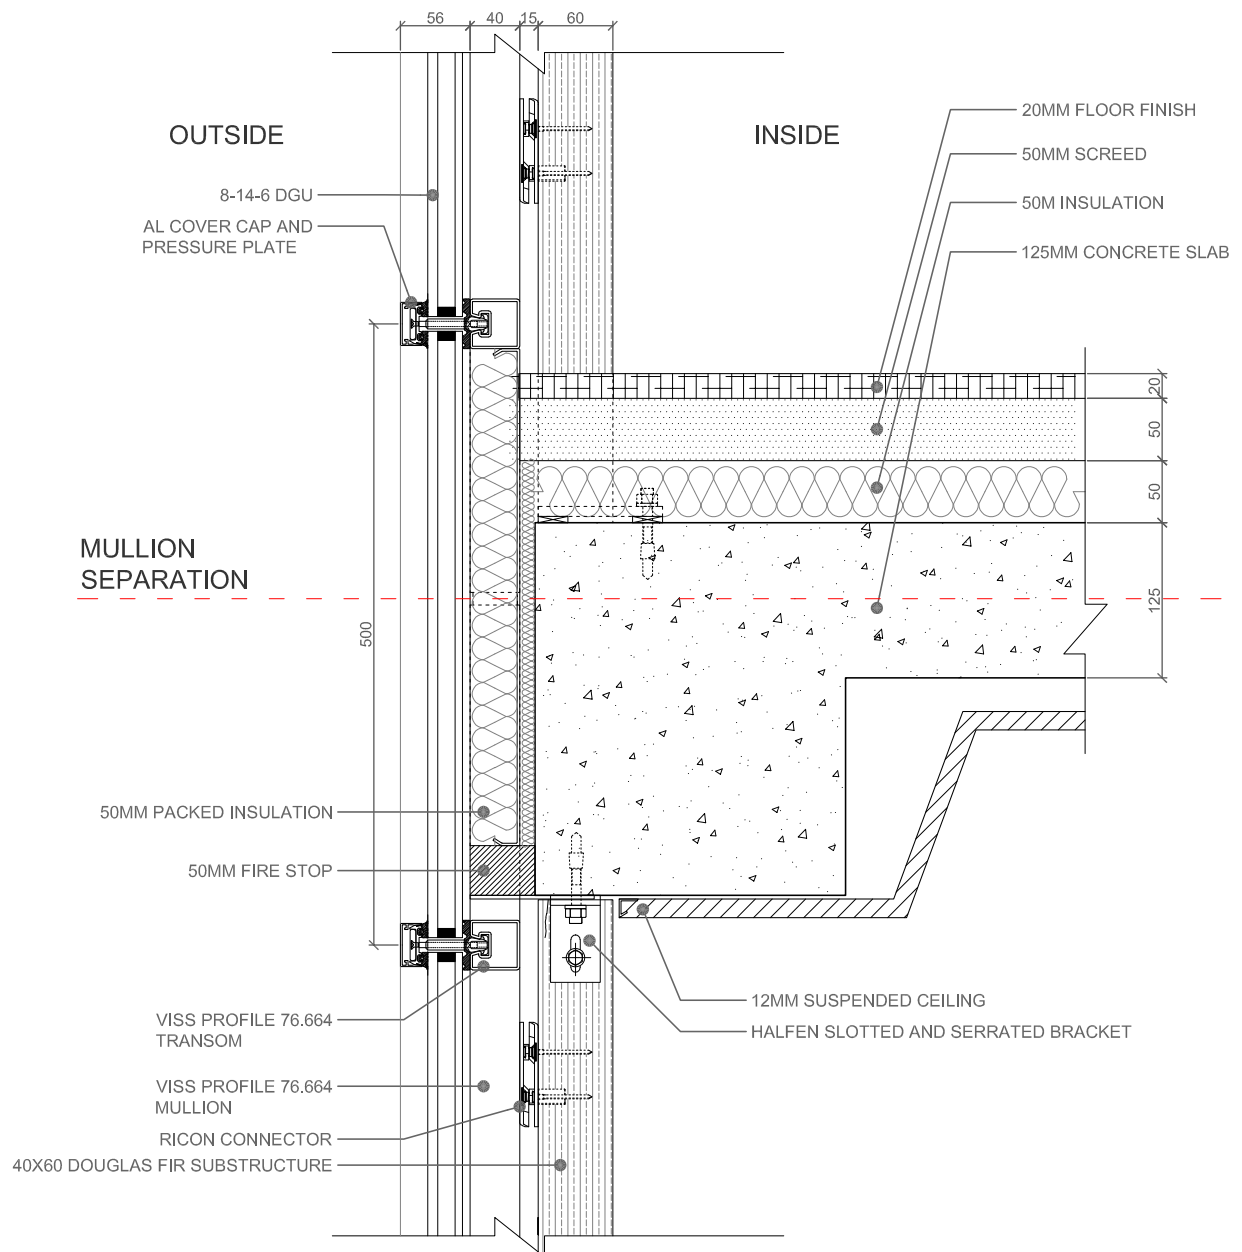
Sectional view showing the fixing of the mullion to the timber substructure (source: author)
